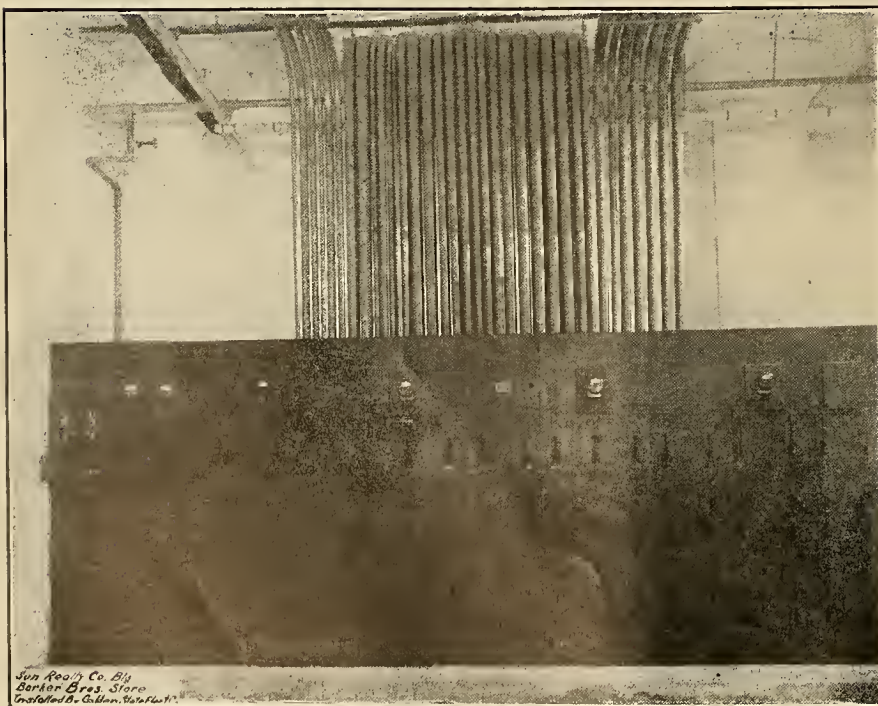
Front view of the main switchboard showing the three rows of switches. Notice the manner in which the conduit runs branch at the ceiling.
